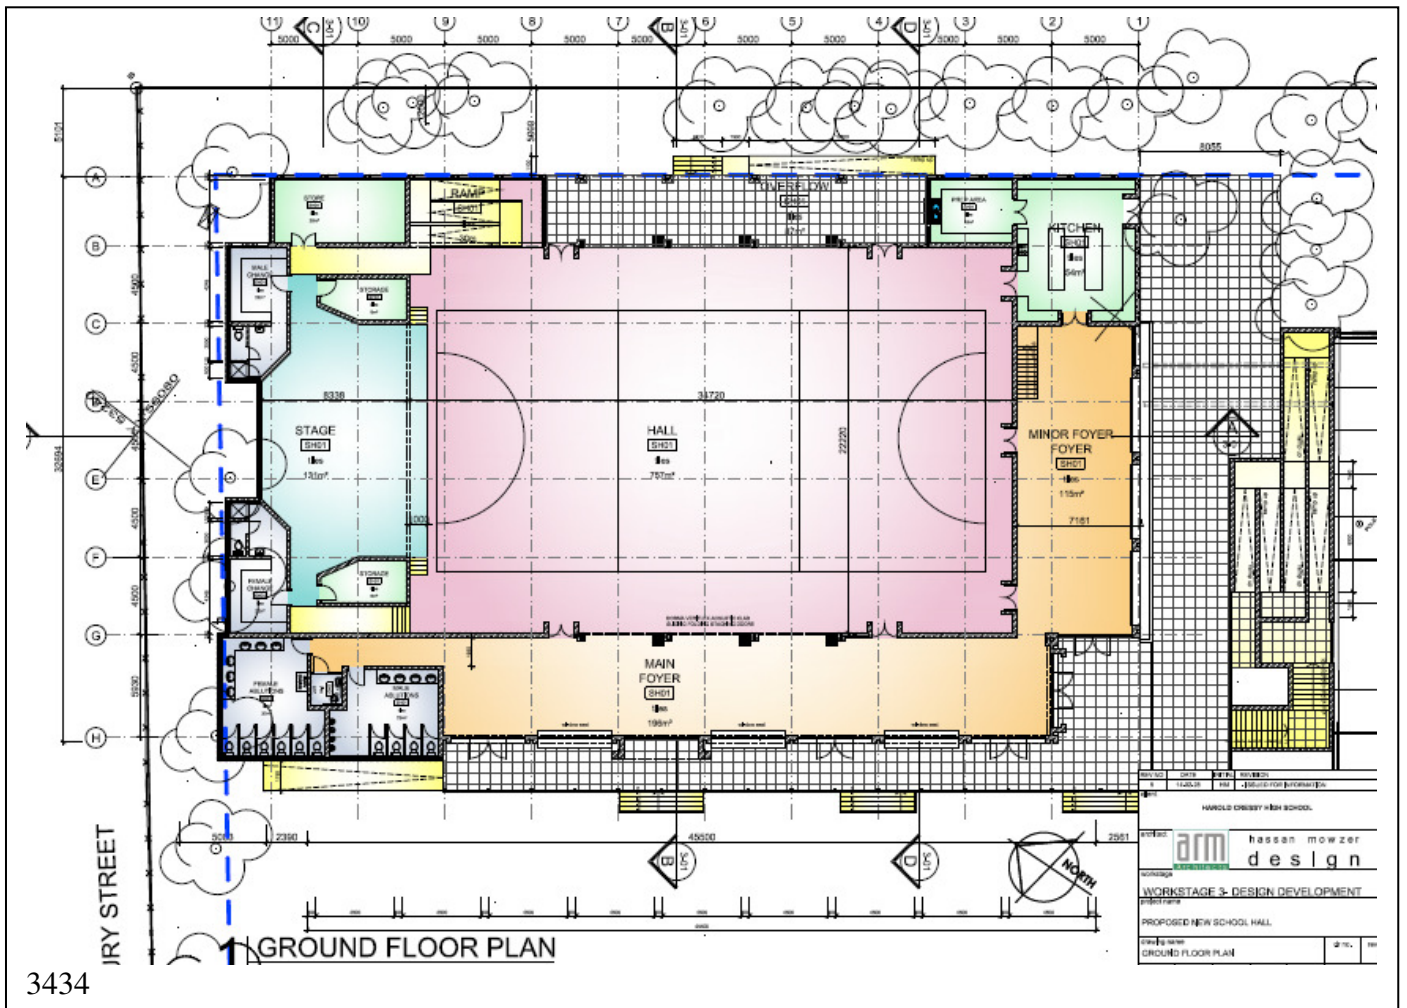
Ground floor plan of proposed hall at preferred siting and placement (ARM, Mowzer Feb 2014)
